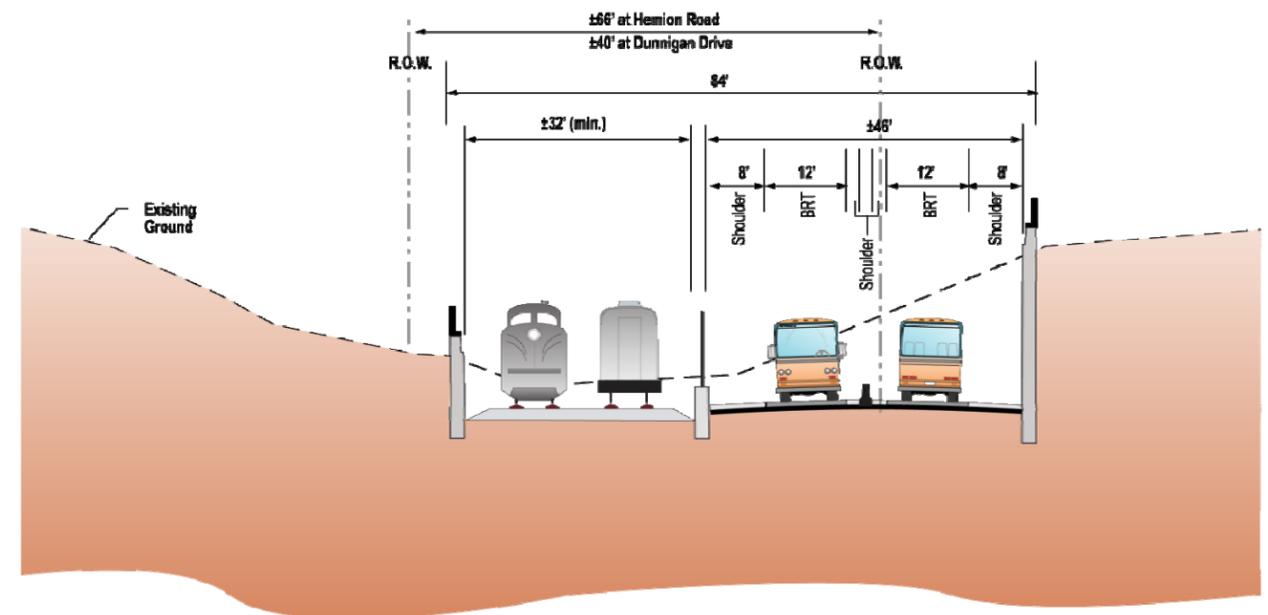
CRT and BRT Busway in the Piermont Line ROW Typical Cross-Section West of the Mahwah River
